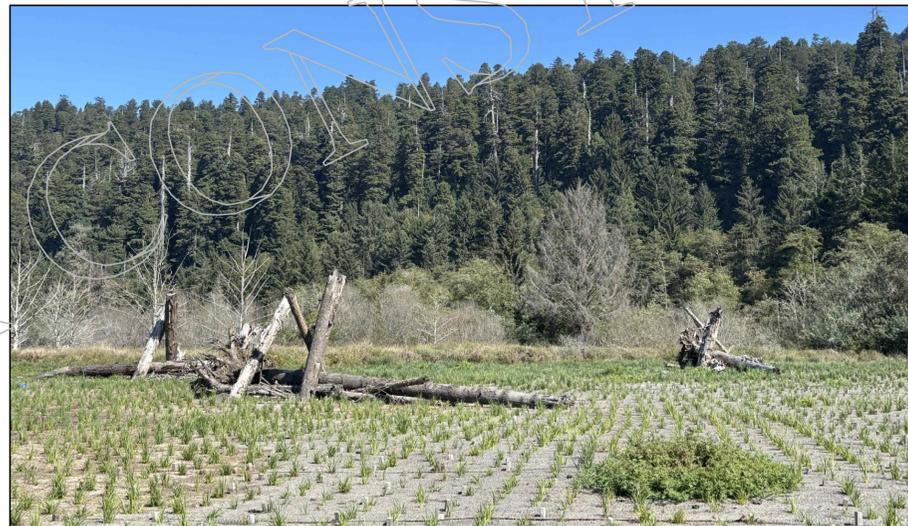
LWS INSTALLATION WITHIN FLOODPLAIN. PHOTO OF LWS INSTALLED AT PRAIRIE CREEK, HUMBOLDT COUNTY.
